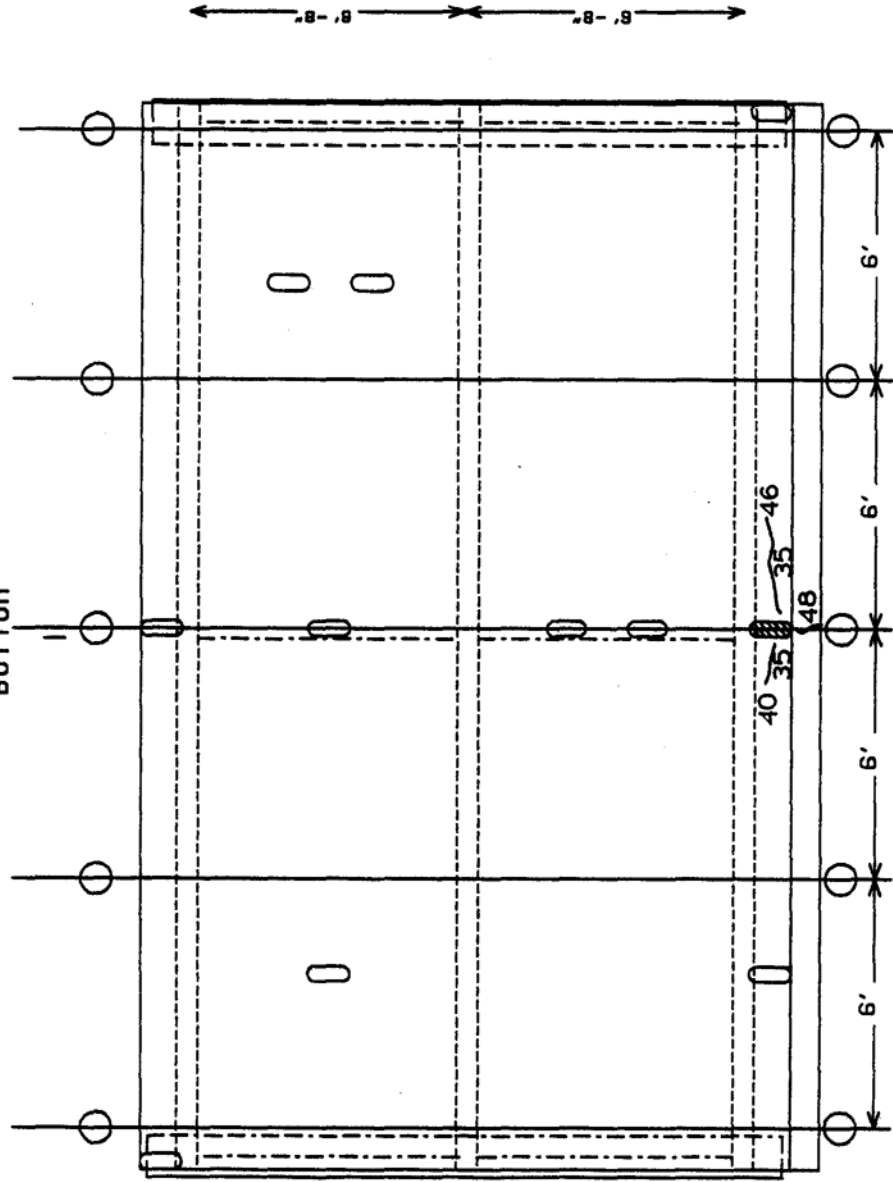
Bottom Cracking Pattern (First Bridge - Test No. 3)
